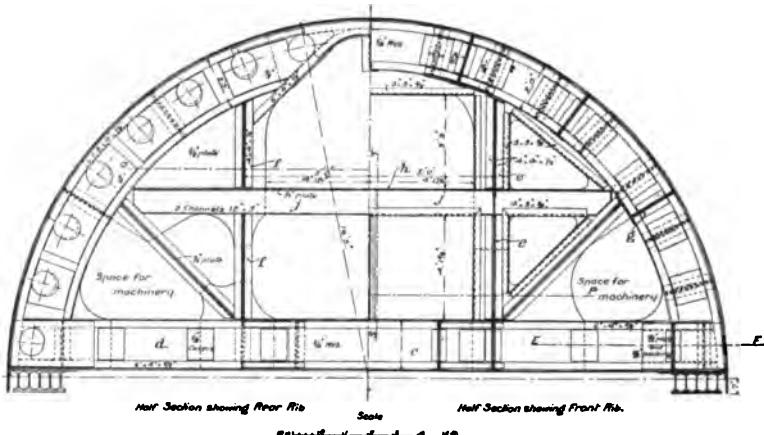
East Boston tunnel (A-13). Roof shield. Cross section front and rear. (Courtesy of W. C. Copperthwaite.)
